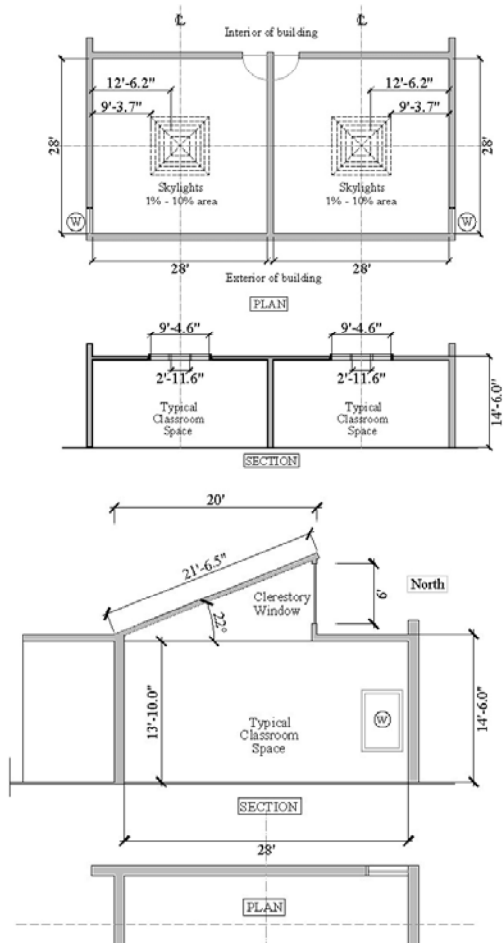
Plan and section of typical classroom showing proposed skylight and clerestory cases. The dotted lines in the skylight cases indicate the varying sizes of skylights.
